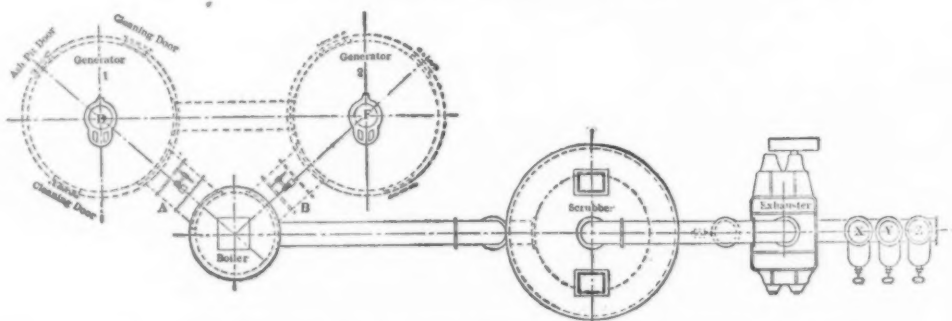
PLAN VIEW OF LOOMIS-PETTIBONE PRODUCER-GAS PLANT.
